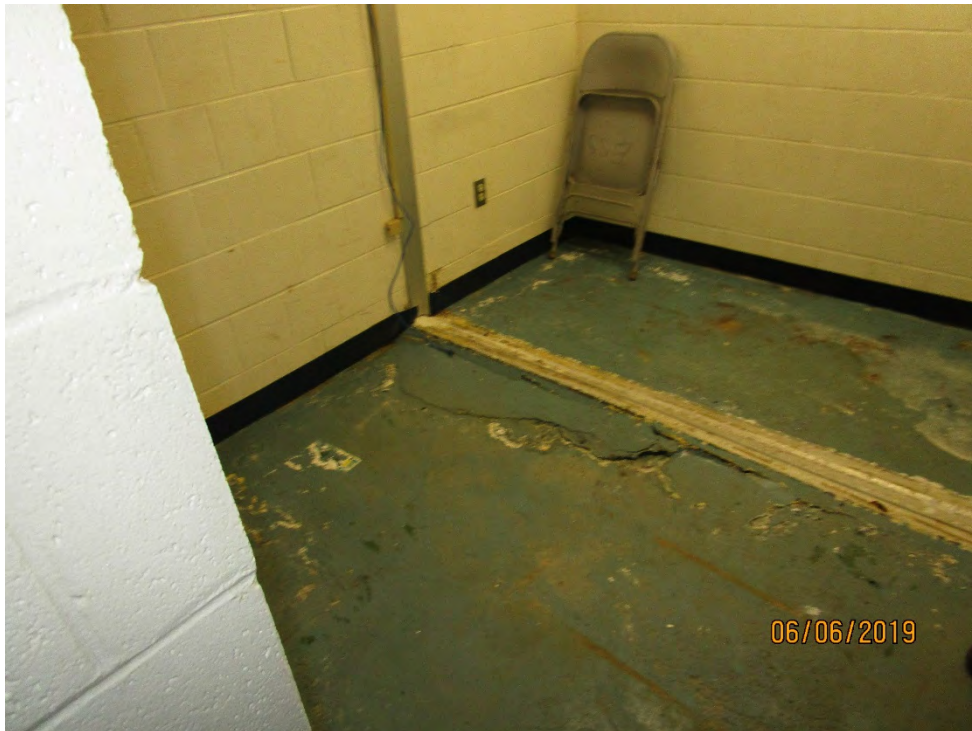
FLOOR SLAB DETERIORATION AT WEST EXPANSION JOINT
